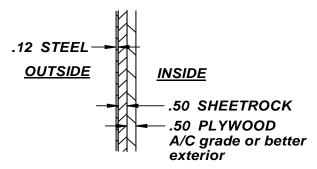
SLP-22 wall laminate shown with steel outer covering.
